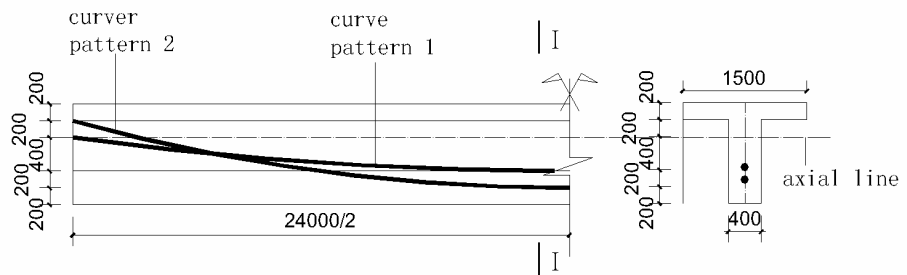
Parabolic pre-stressed steel bars' lay-out (mm)
